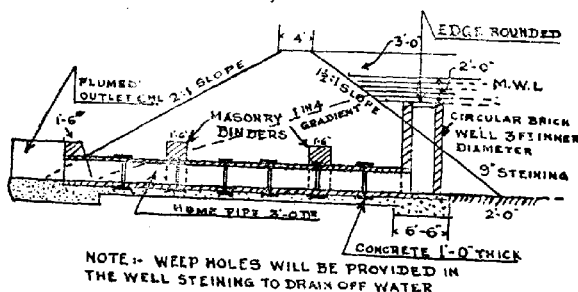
SKETCH OF A HUME PIPE CULVERT WITH CIRCULAR BRICK WELL DROP INLET
